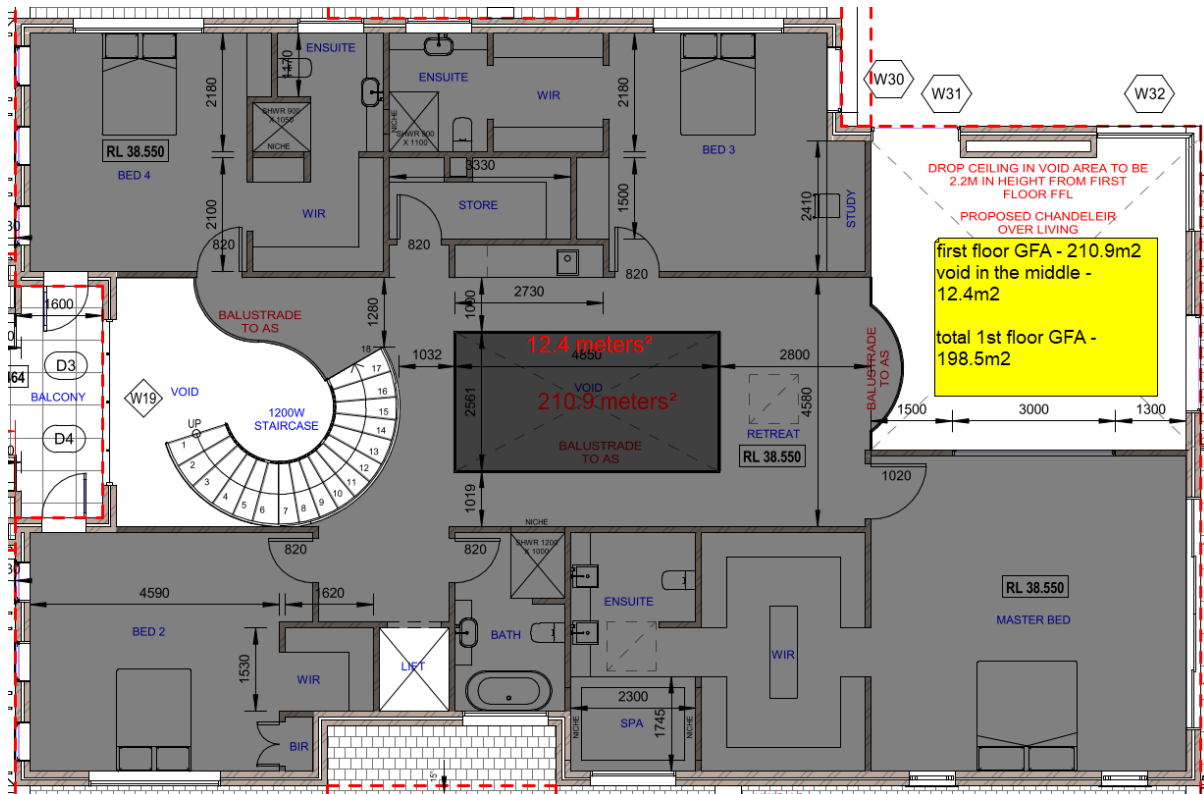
Extract of the first floor plan (source: Nemco Design, dated 22/09/2020)
